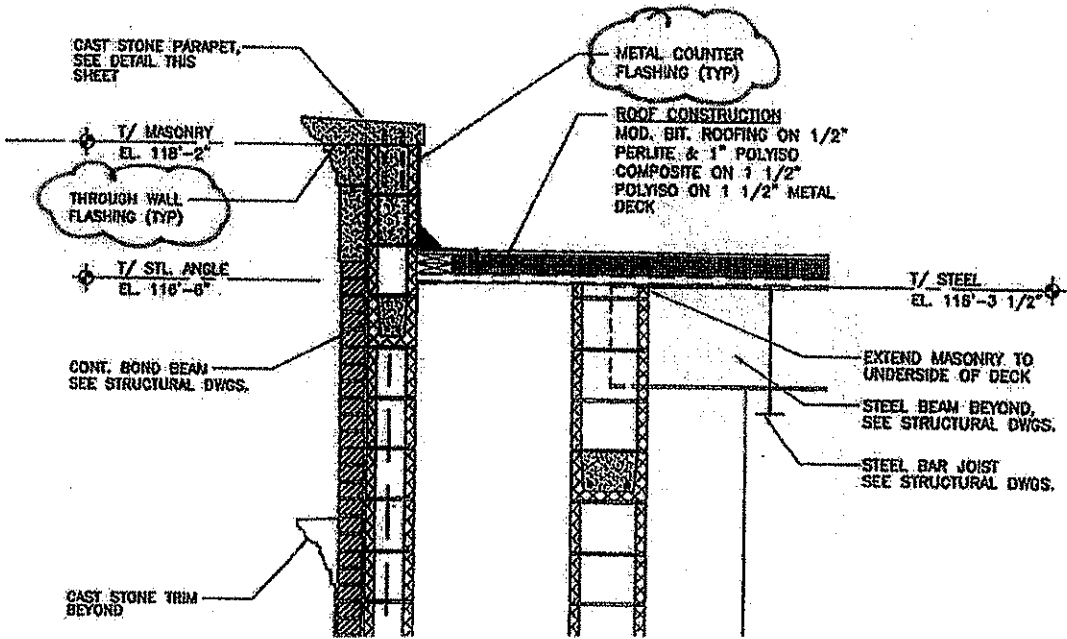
Wall Section from Construction Documents Showing Through Wall Flashing to be Installed
